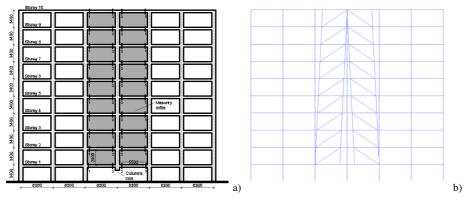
Case study structure: a) Geometric details of the frame; b) Model.
